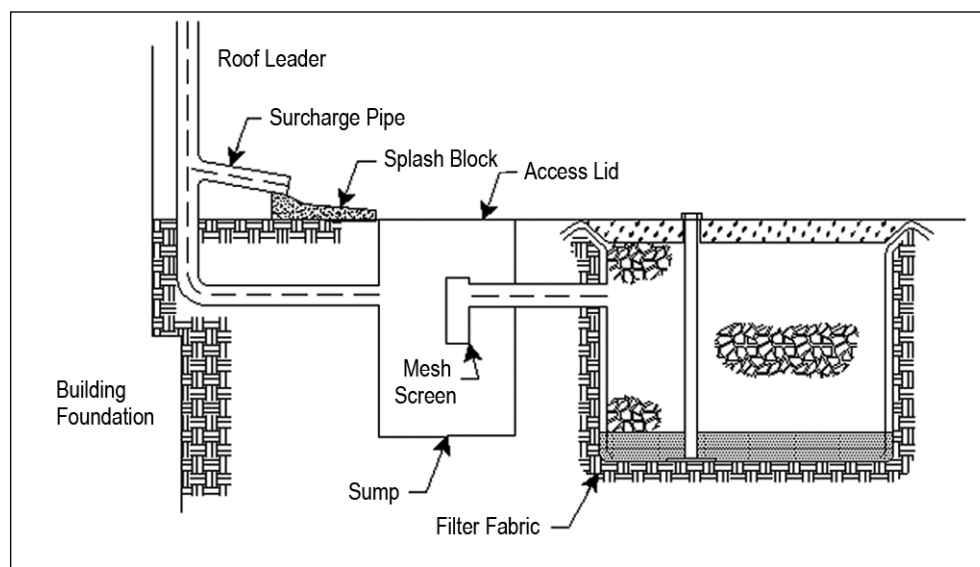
Underground pretreatment facility and infiltration trench for treating rooftop runoff.
